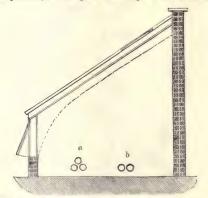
Section of Lean-to Peach-House, showing Position for (a) three 3in. and (b) two 4in. Hot-water Pipes.
